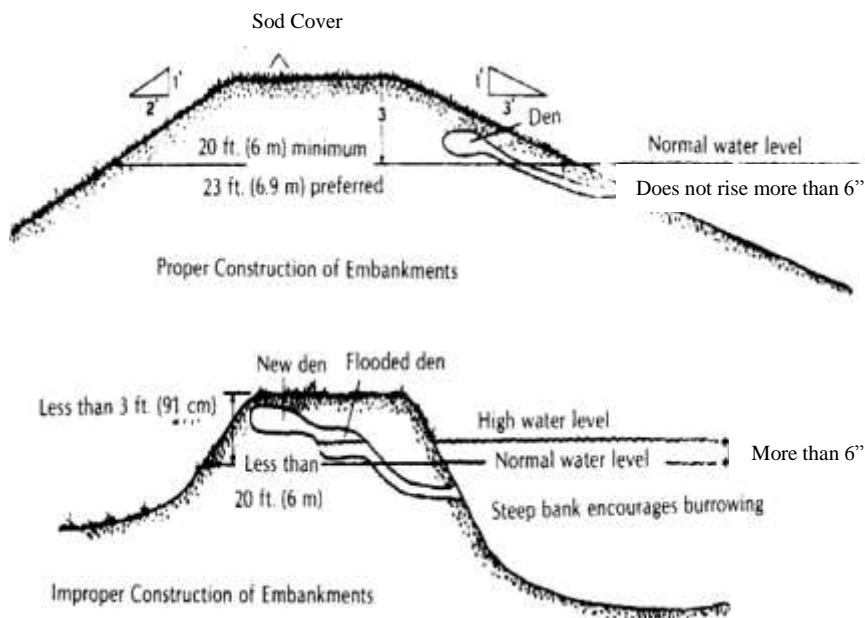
Proper dam construction can reduce muskrat damage to the structure.
